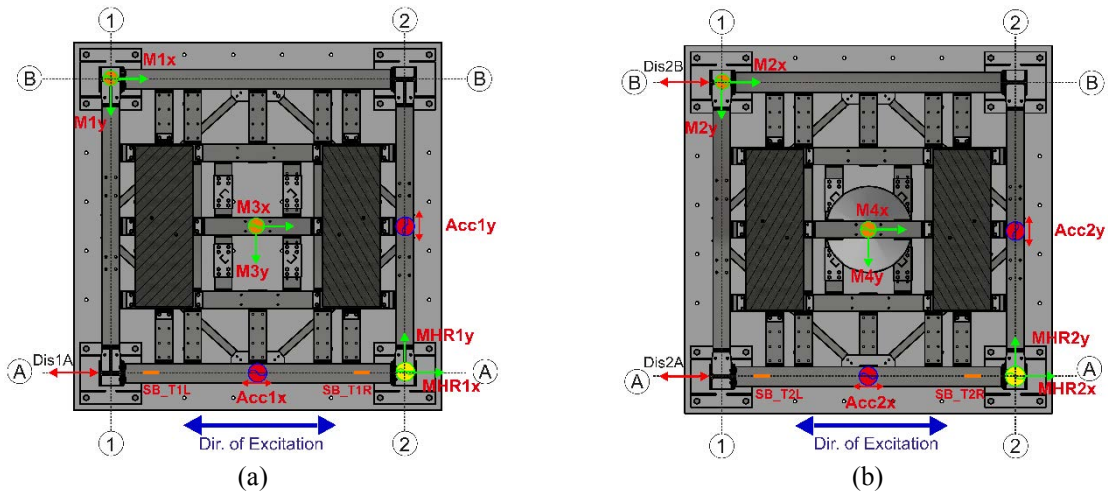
Instrumentation Scheme – Floor views (a) First floor (b) Second floor.
